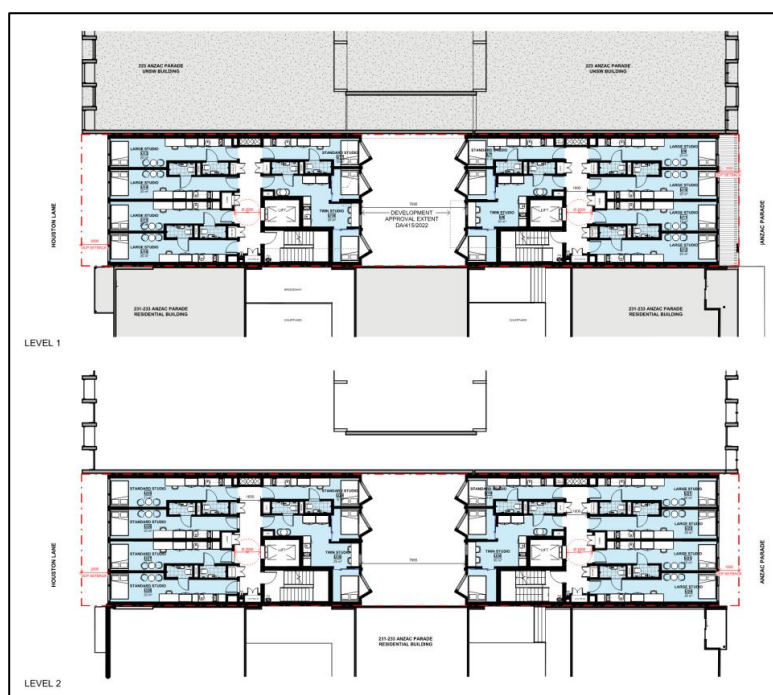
Floor Plans for level 1 and 2 (Source: Applicant)
